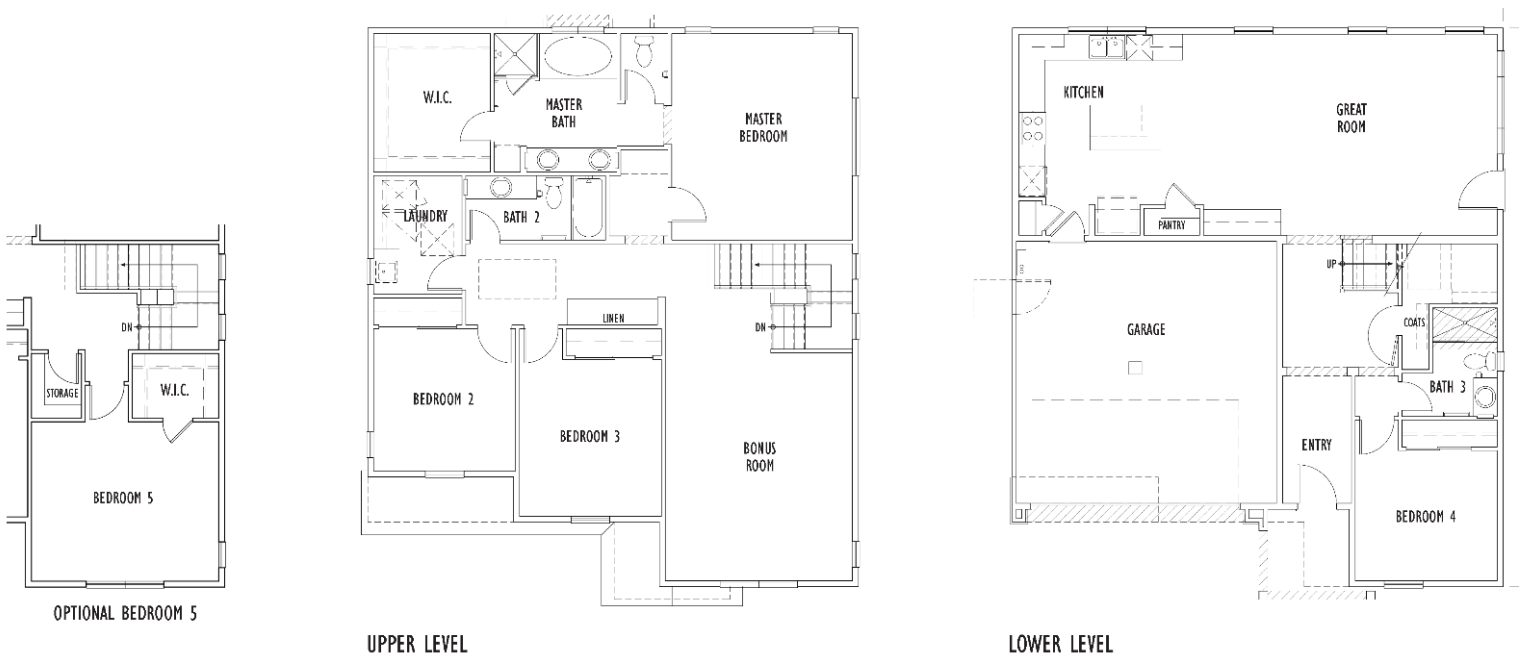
Exhibit B — FLOOR PLANS AND EXTERIOR ELEVATIONS – PLAN 3
